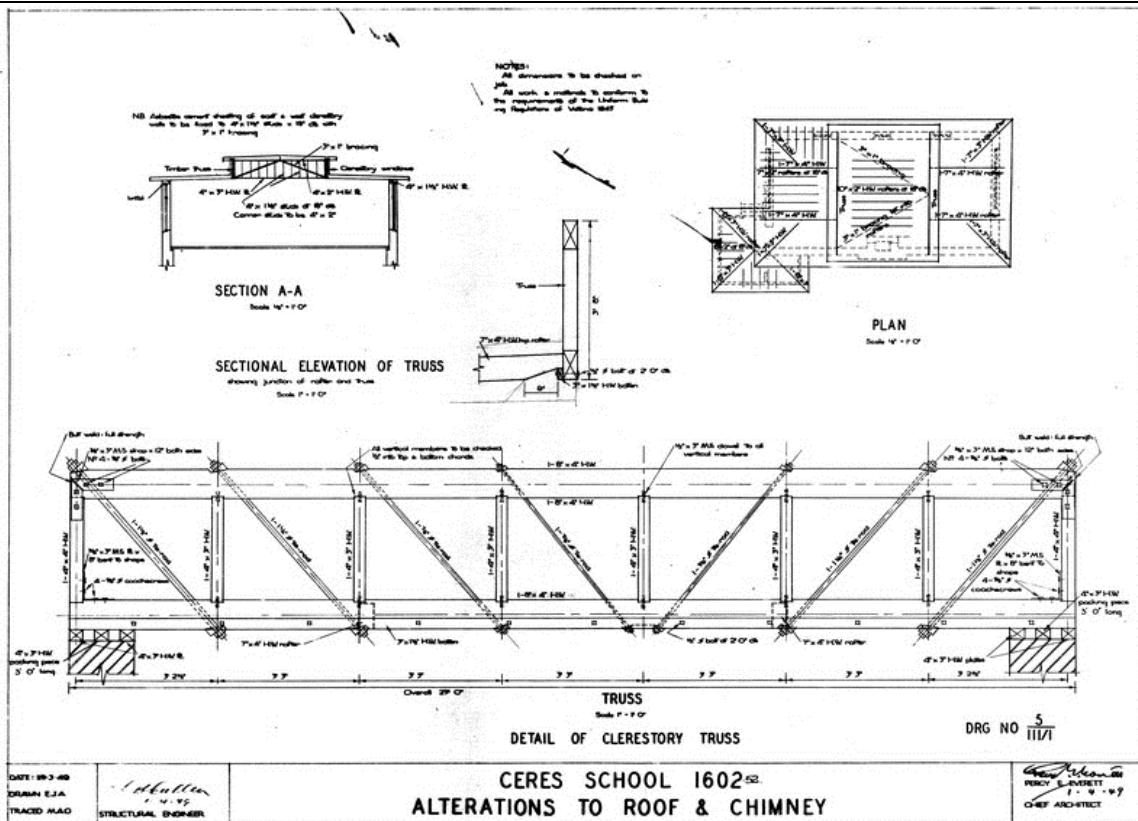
P. Everett, Proposed Alterations to Ceres School – Roof Plan, Section & Detail of Clerestory Truss, 1 April 1949, Source: Drawing SS 1602.52, Public Record Office Victoria.
